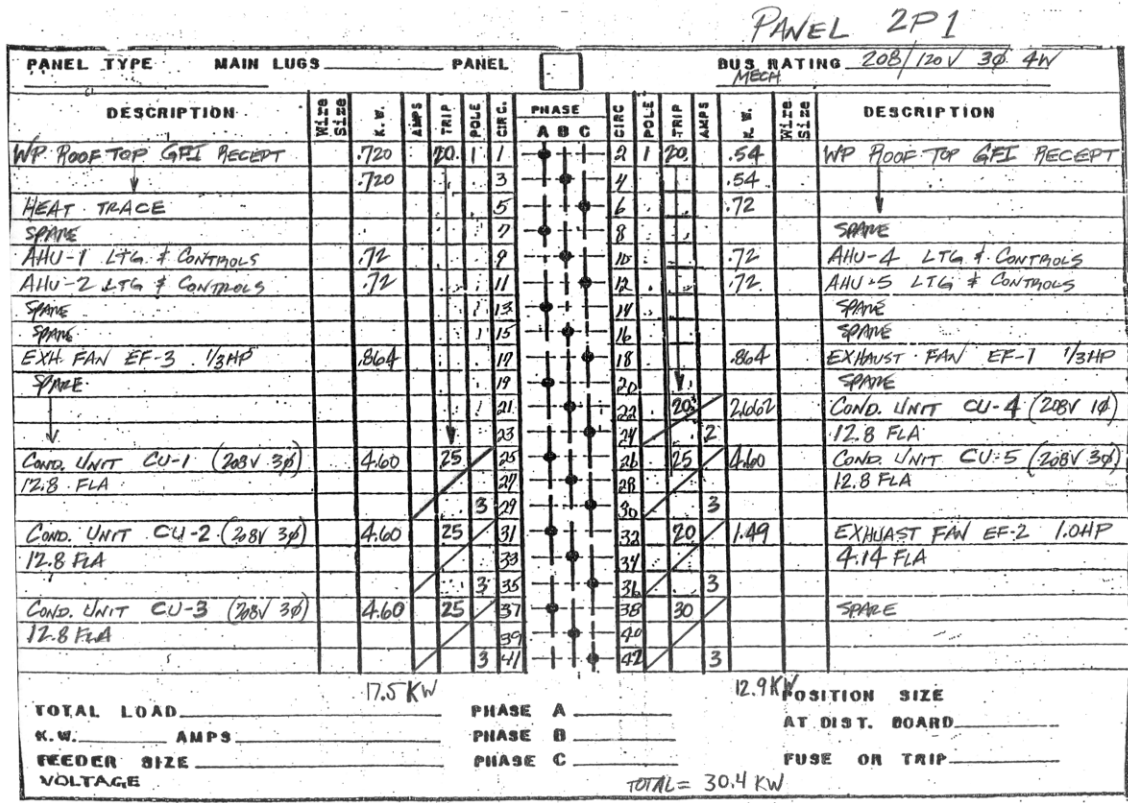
| 2P1 – Existing Design – Layout Provided by Hornfeck Engineering
